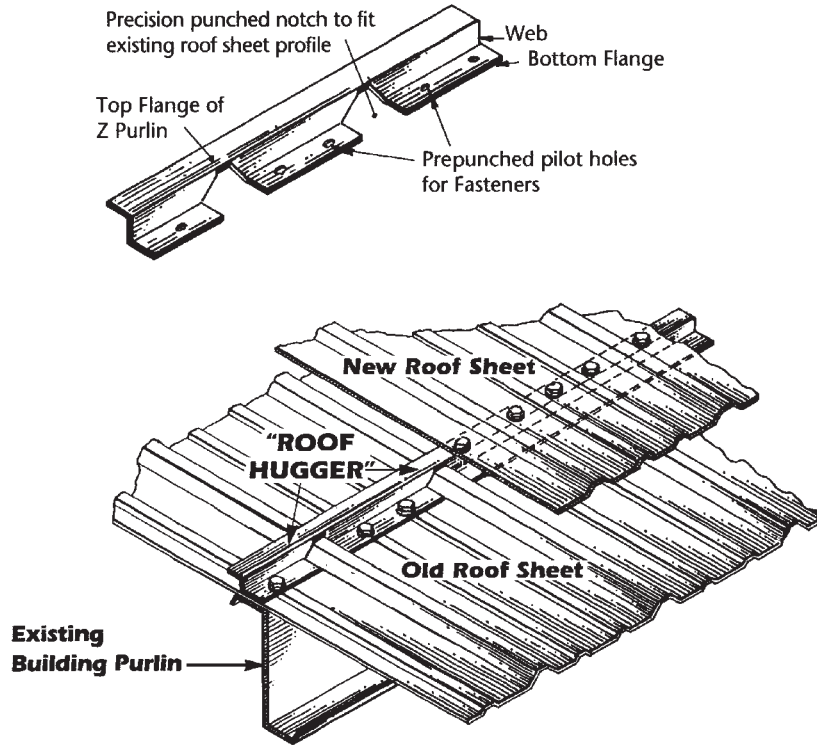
Roof Hugger. (Roof Hugger Inc.)
